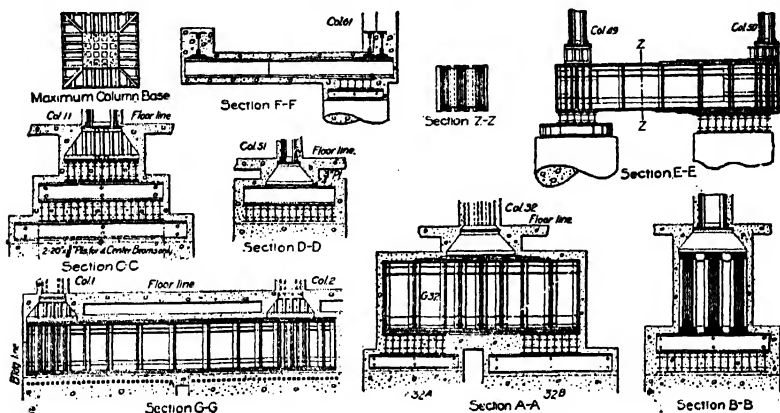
(b).—Grillage foundation of the Woolworth Building, New York.
